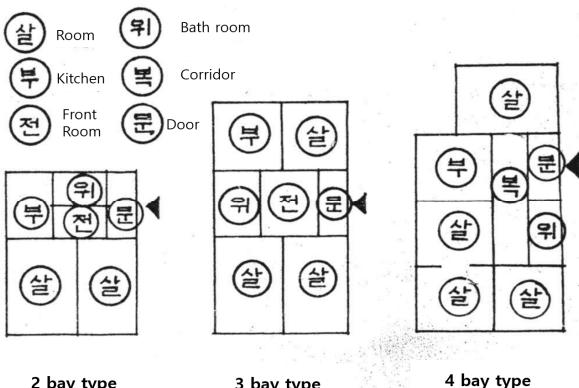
House plan diagrams of D.P.R.K (Vol.94-03)
